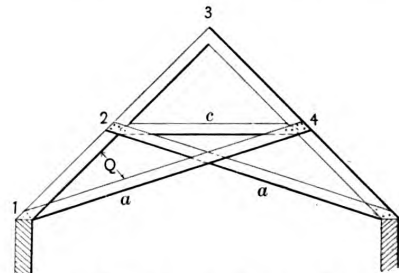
Form of Truss Adapted for Spans not Exceeding 32 Feet.
